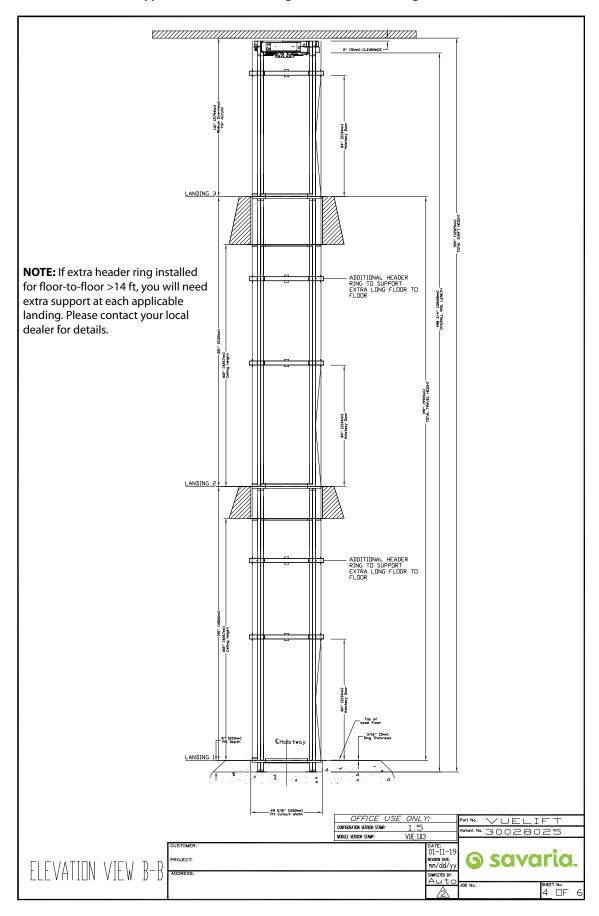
Elevation view (OGL, type 1) - extra header rings if floor-to-floor height > 14 ft
